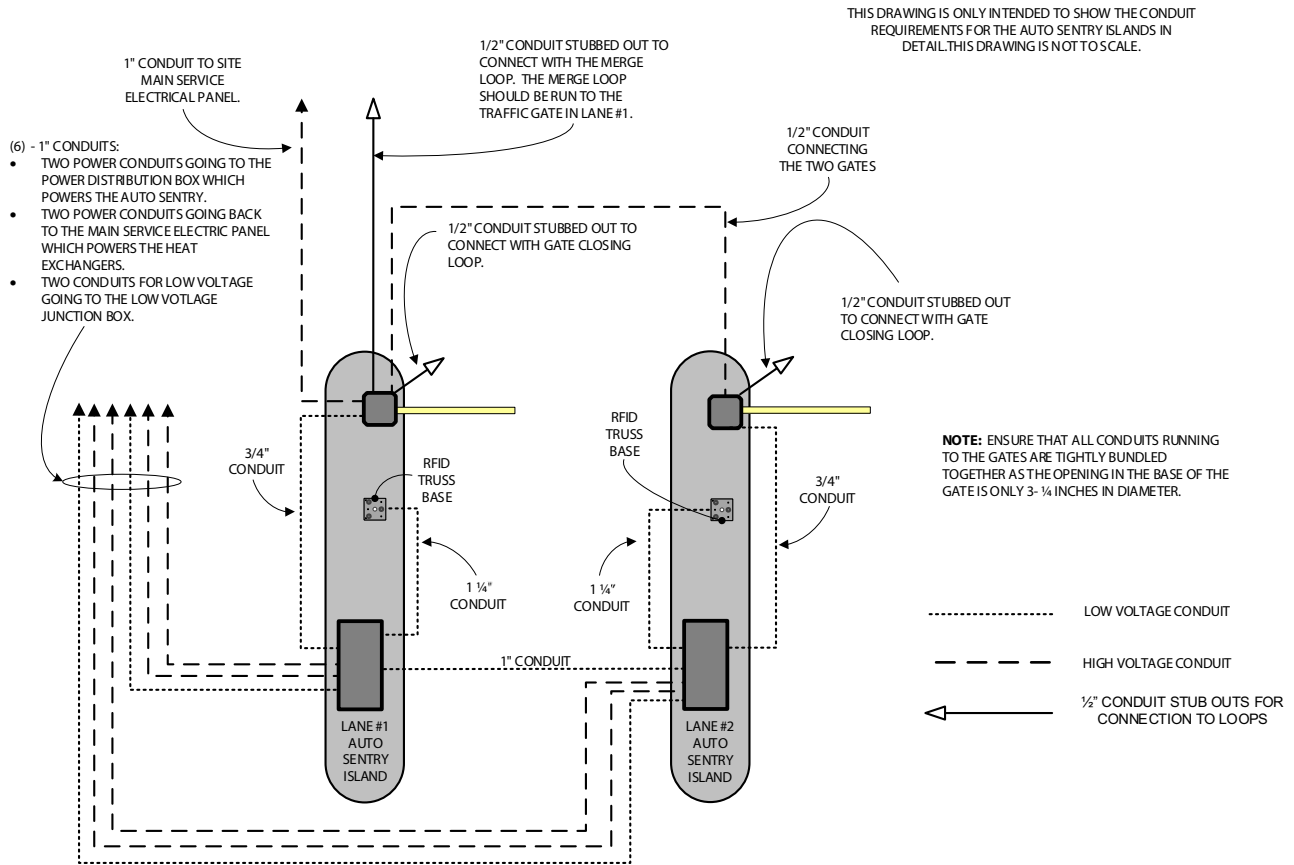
Conduit Layout Dual Lane (Express Car Wash)
